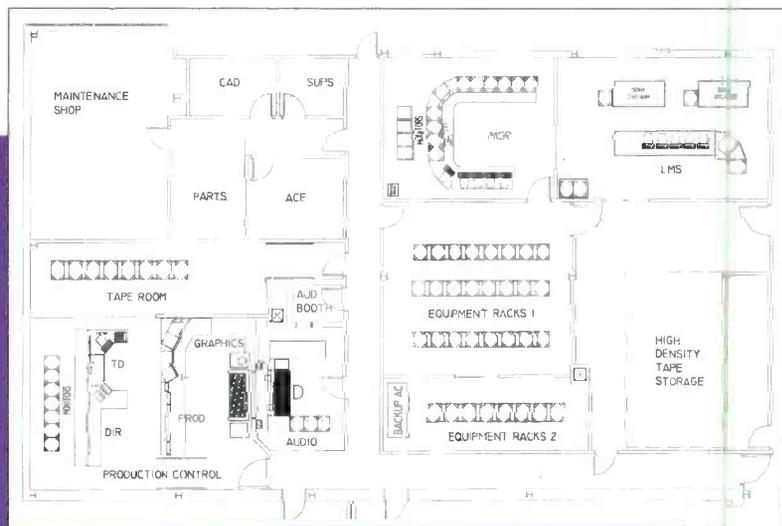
Simplified floor plan of the technical areas of the new KPTV building. All broadcast functions are built around a centralized technical core, which includes two equipment rooms and master control. (Courtesy of KPTV.)
